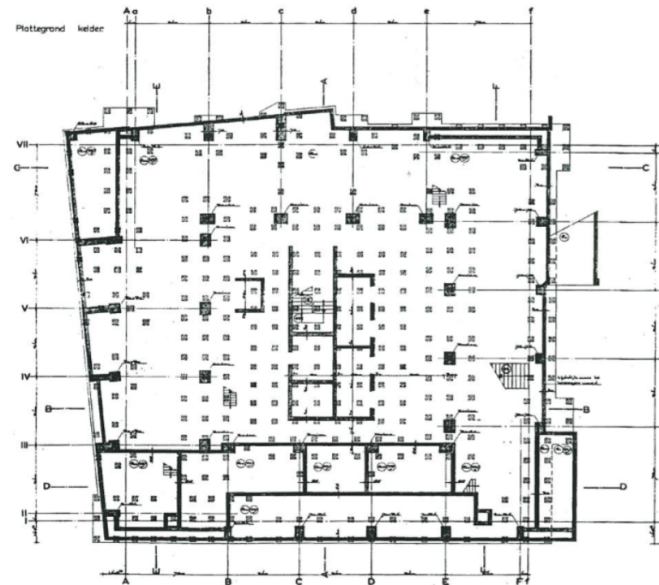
Westerlaantoren - Basement floor plan with pile locations indicated
